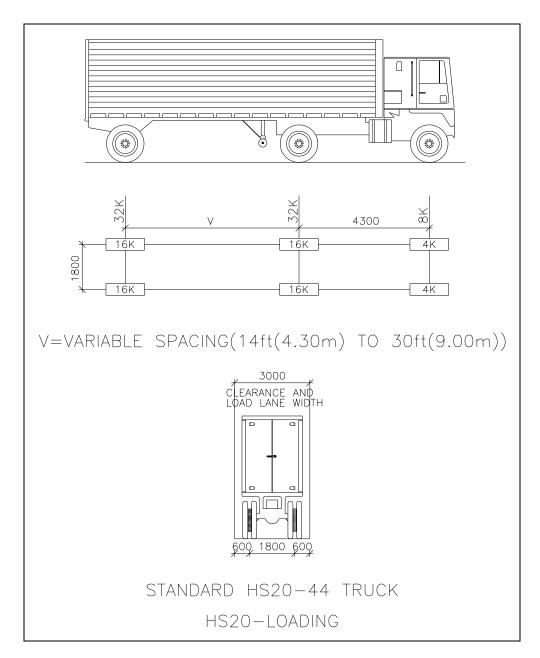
Longitudinal and Transversal Sections of AASHTO HS20 Design Truck
